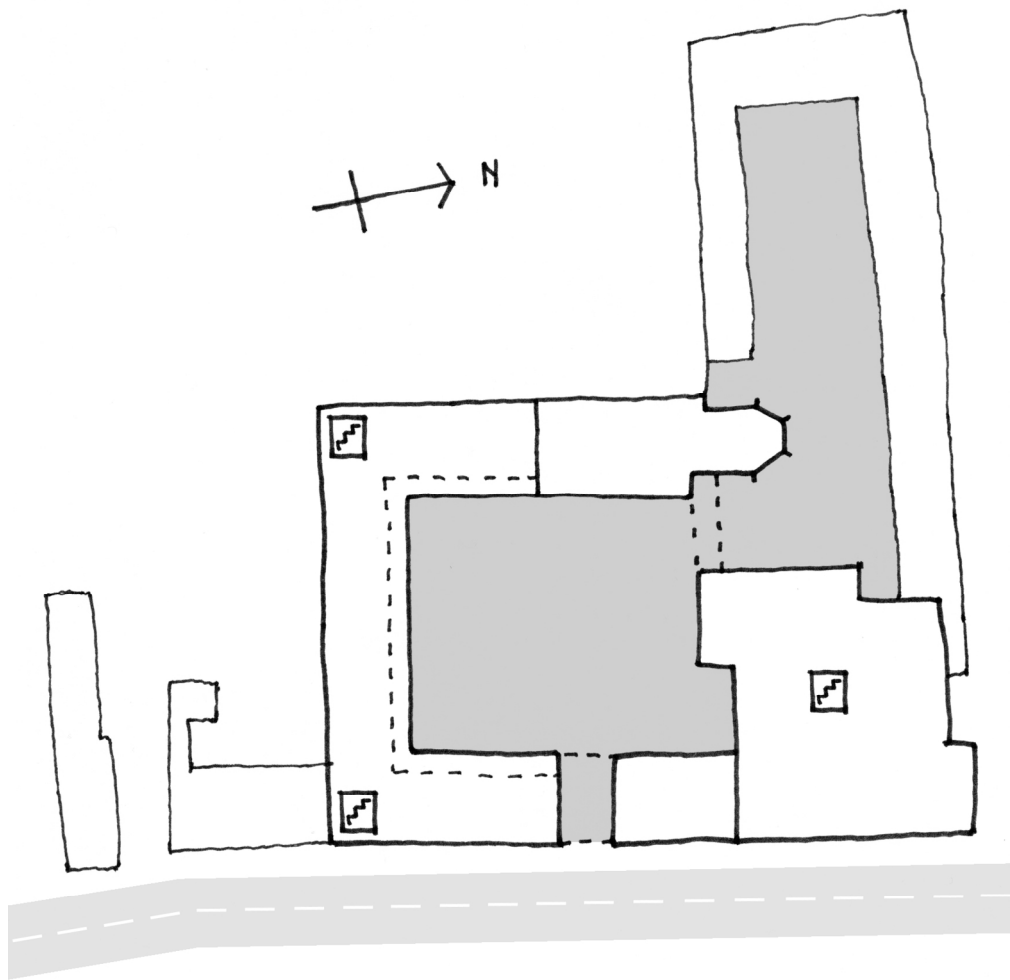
Layout of the college: 1 arched doorway, 2 knight house, 3 chapel, 4 U-shaped building, 5 auxiliary buildings (drawing: omitted for blind review).
